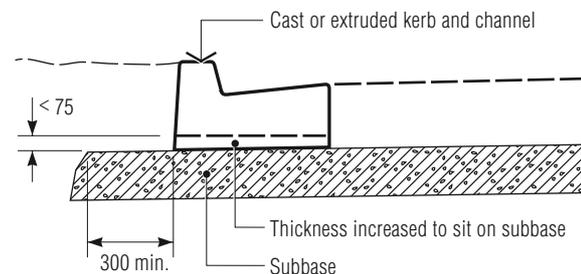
Depth of section extended where bedding would be less than 75 mm thick.
